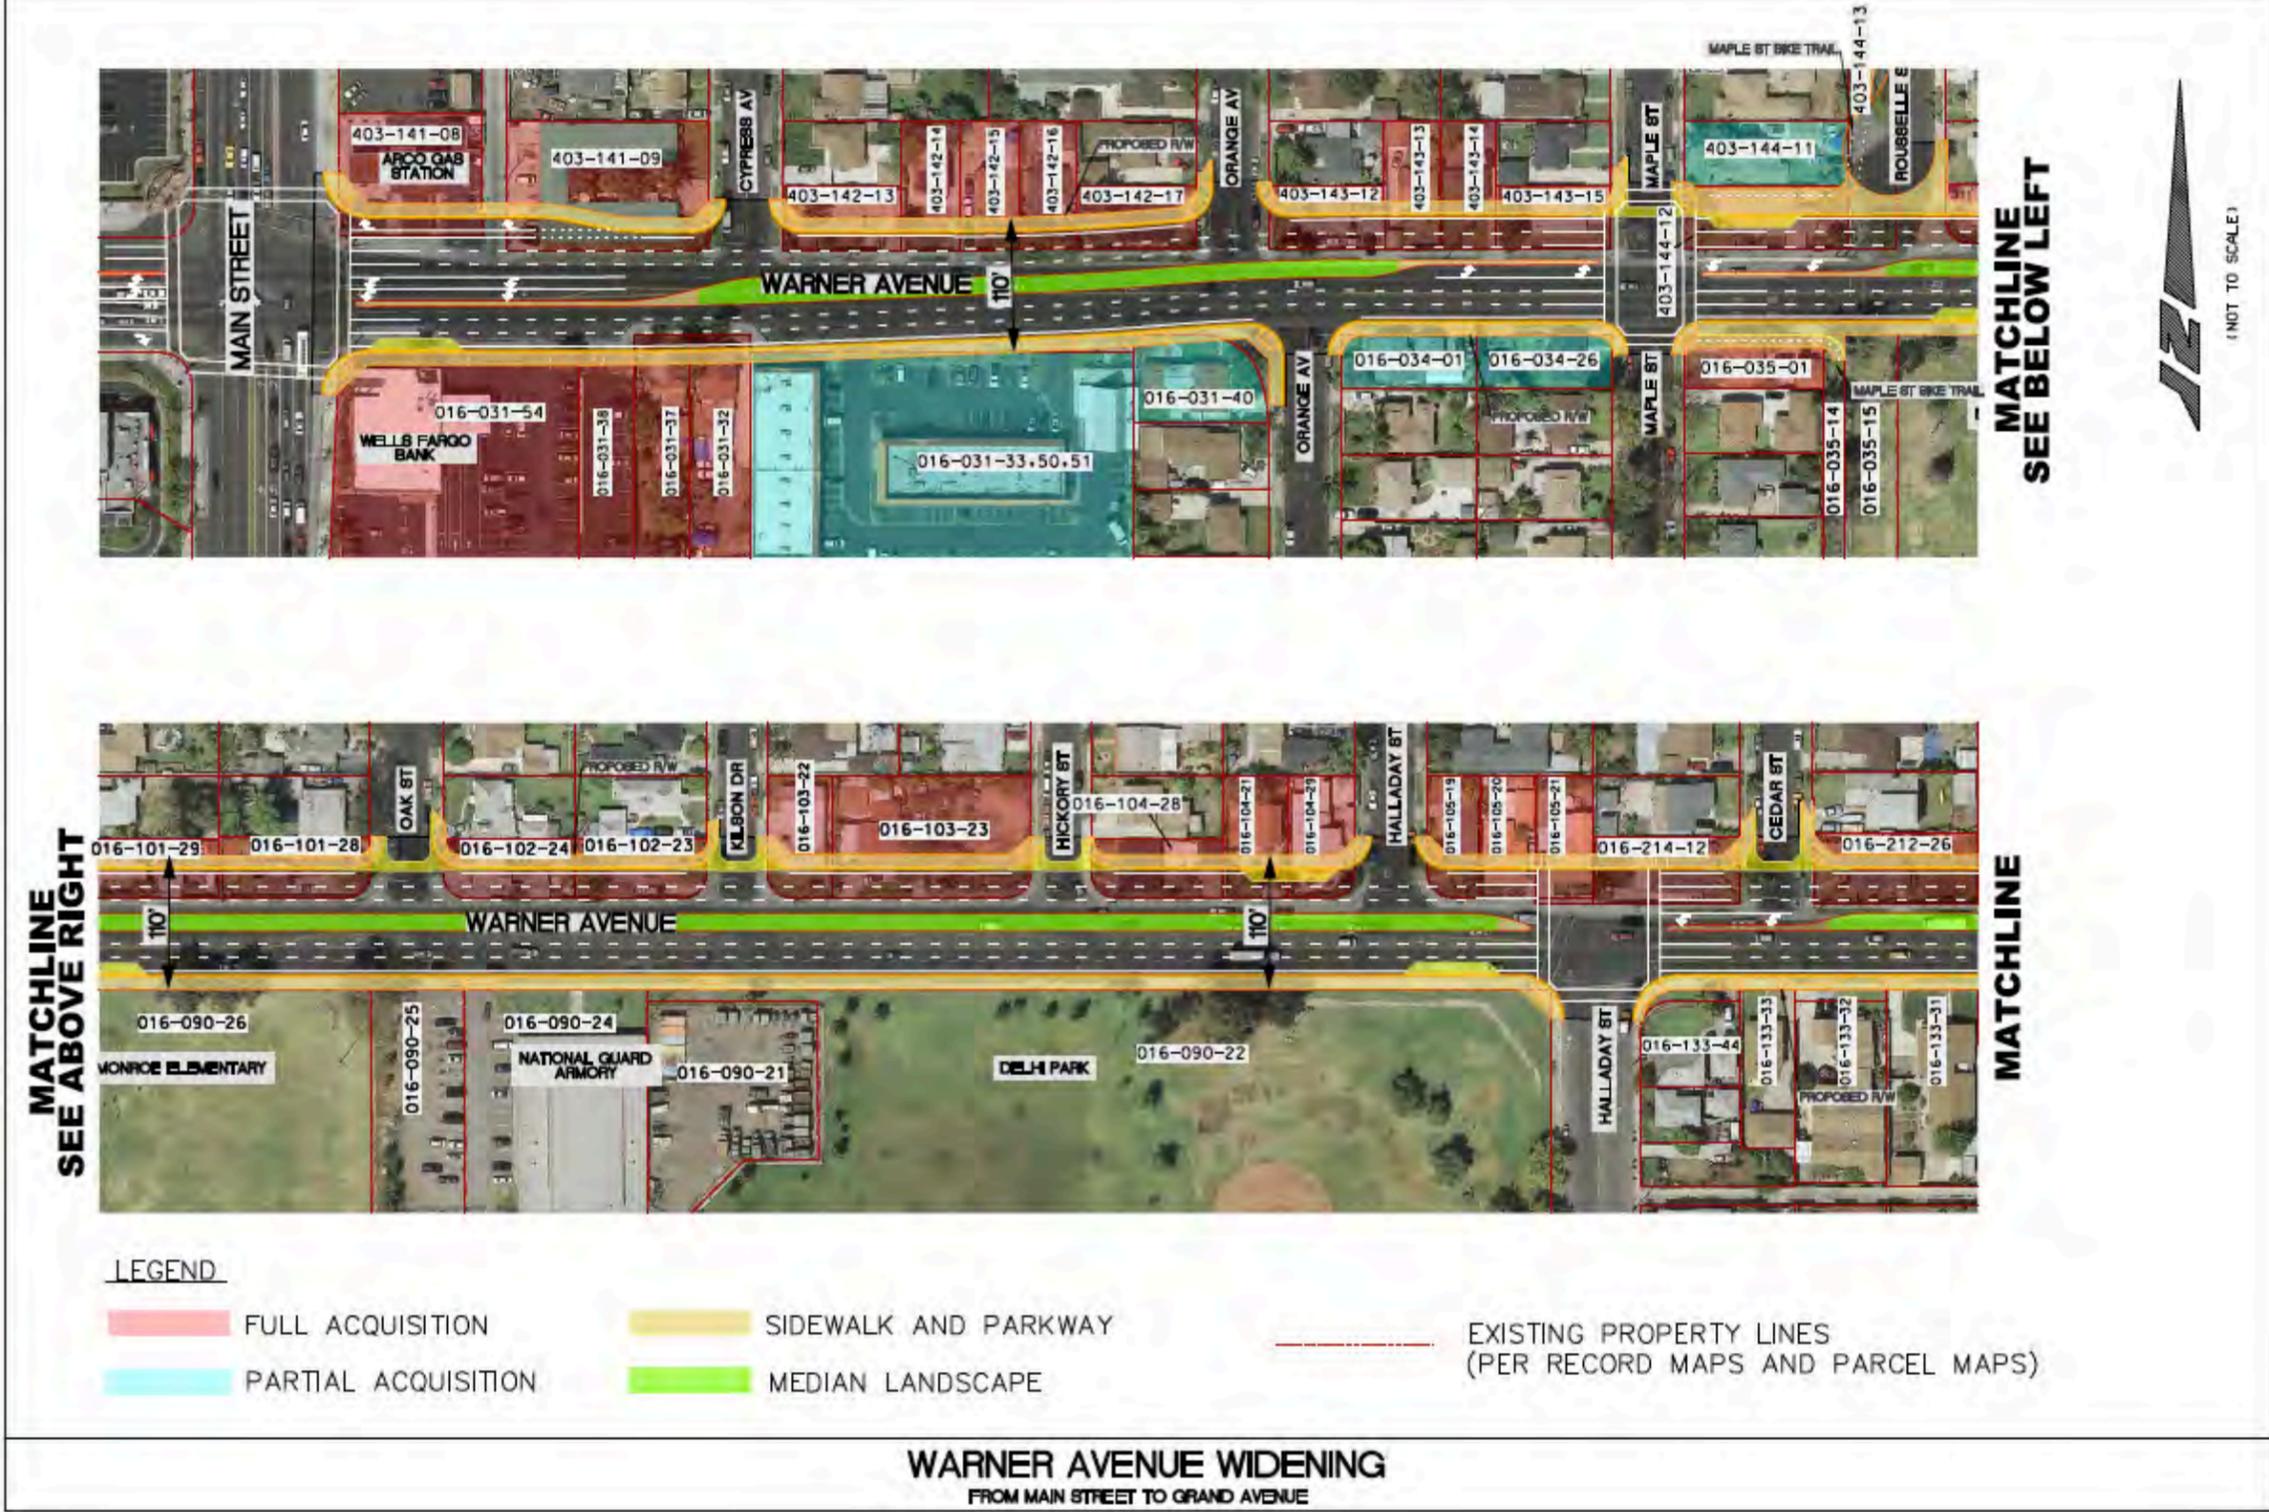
Proposed Warner Avenue Road Widening Project, between Main Street to the west and Cedar Street (west of Evergreen Street and Grand Avenue) to the east. Source: City of Santa Ana.
